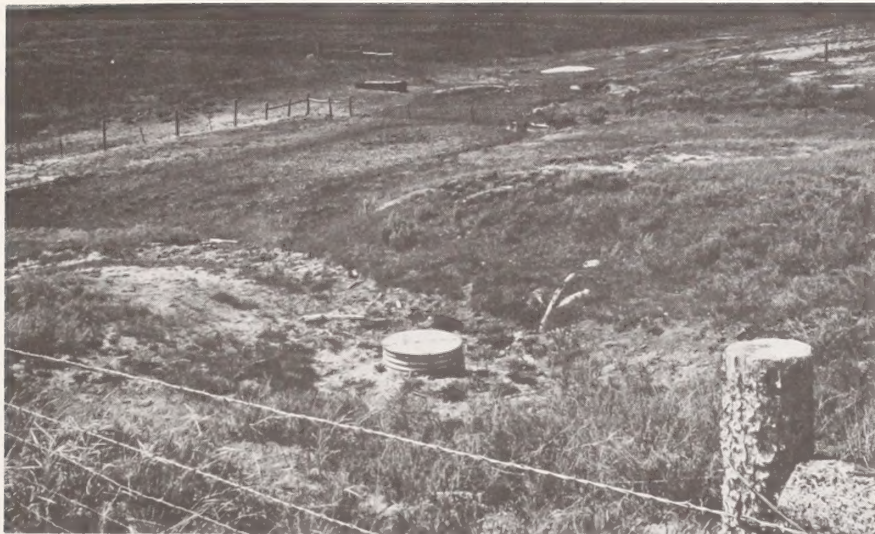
3 TYPICAL SPRING DEVELOPMENT. The photo shows how final installation would appear with storage tank. The spring box design shows how water is collected from seeps.
